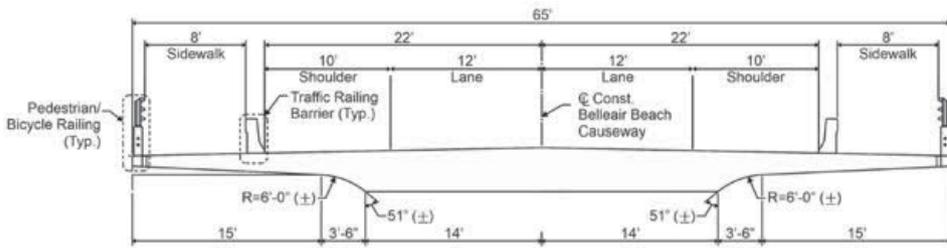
Typical cross section of post-tensioned concrete slab for the east and west approaches to the Belleair Beach Causeway Bridge. Figure: HDR Inc.
